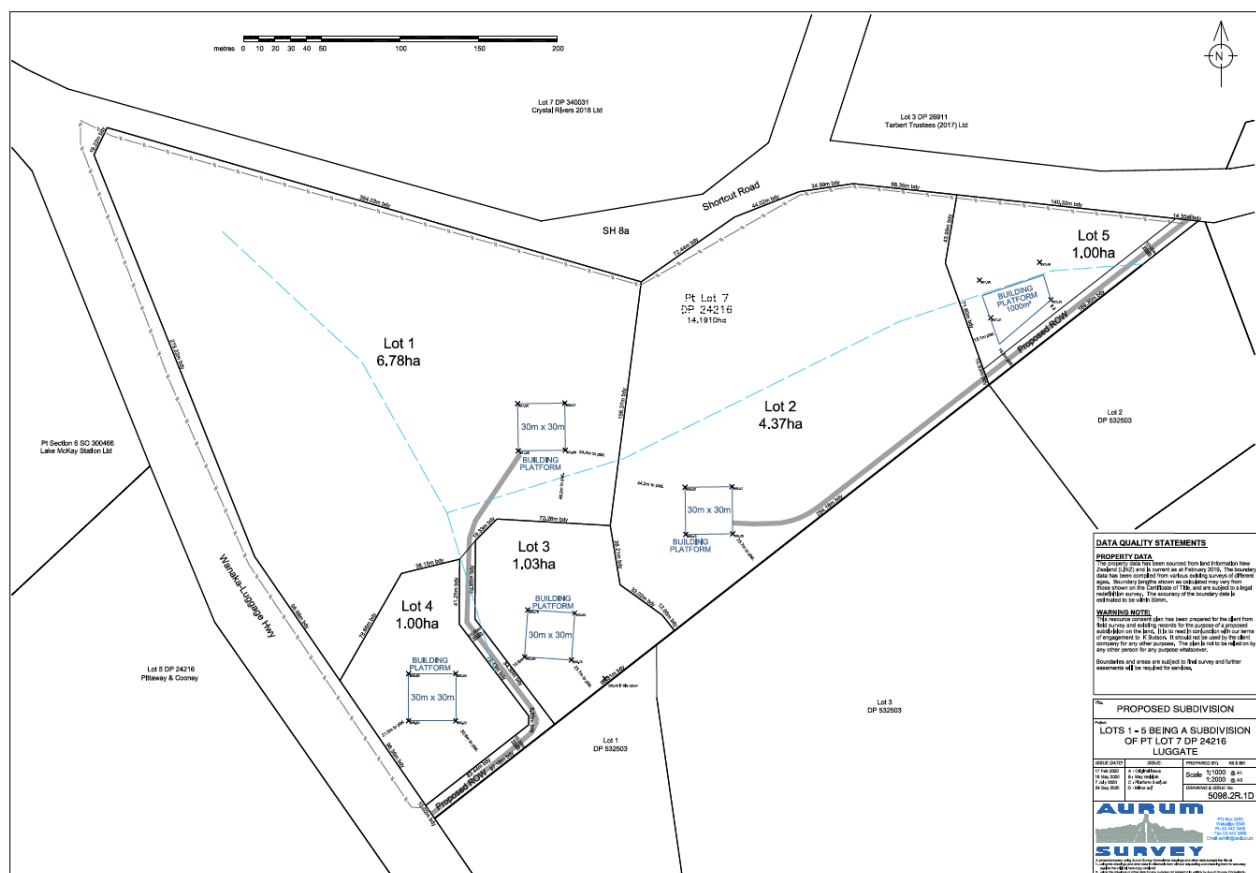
PROPOSED SCHEME PLAN (FULL SIZE PLAN ATTACHED AS APPENDIX B TO THIS APPLICATION)
